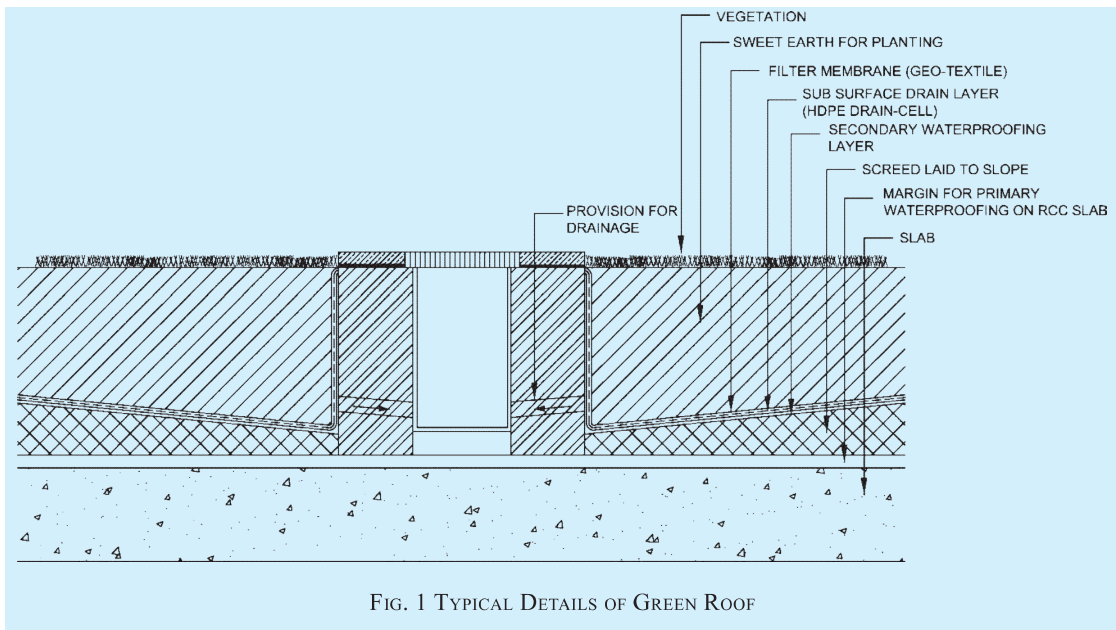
TYPICAL DETAILS OF GREEN ROOF
